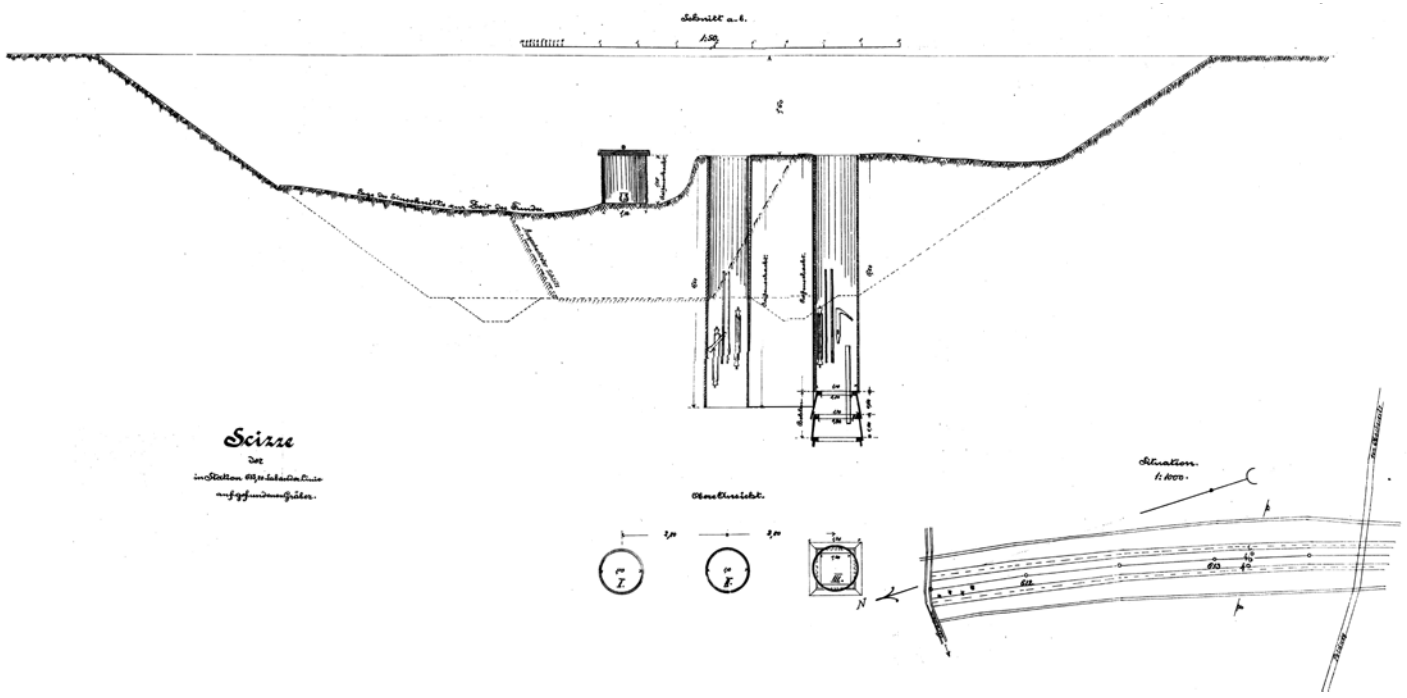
Site sketch accompanying Ehrenberg’s report containing plans and cross-sections of the three »shafts«.
